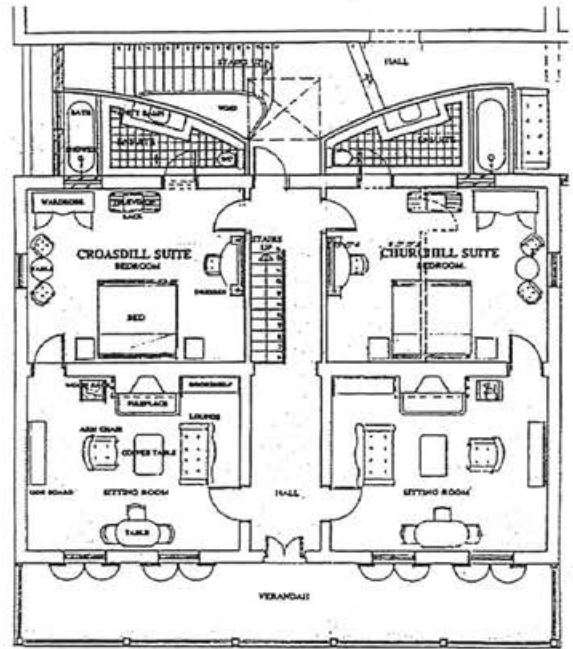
The Architect's solution on the first floor, from the Conservation Plan.
